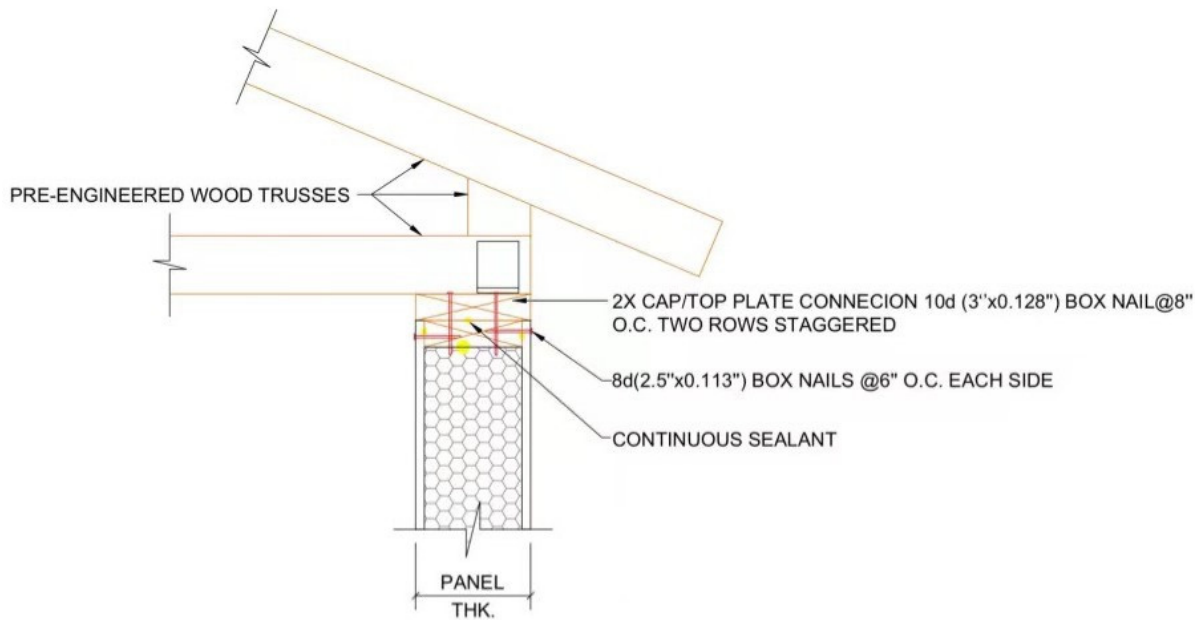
TYPICAL ROOF TRUSS TO WALL PANEL
